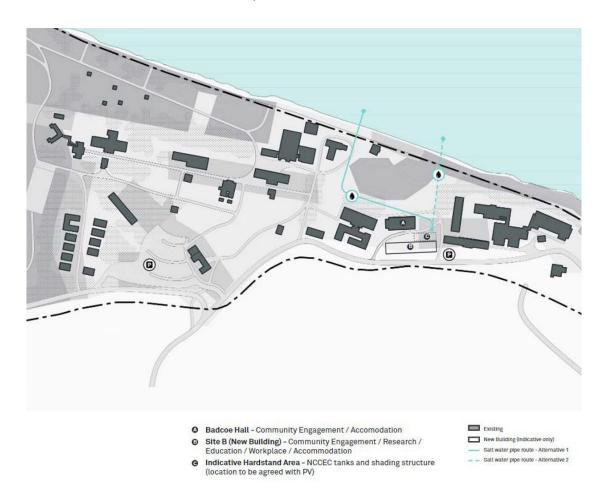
Site plan of proposed research facility (provided by The University of Melbourne).
